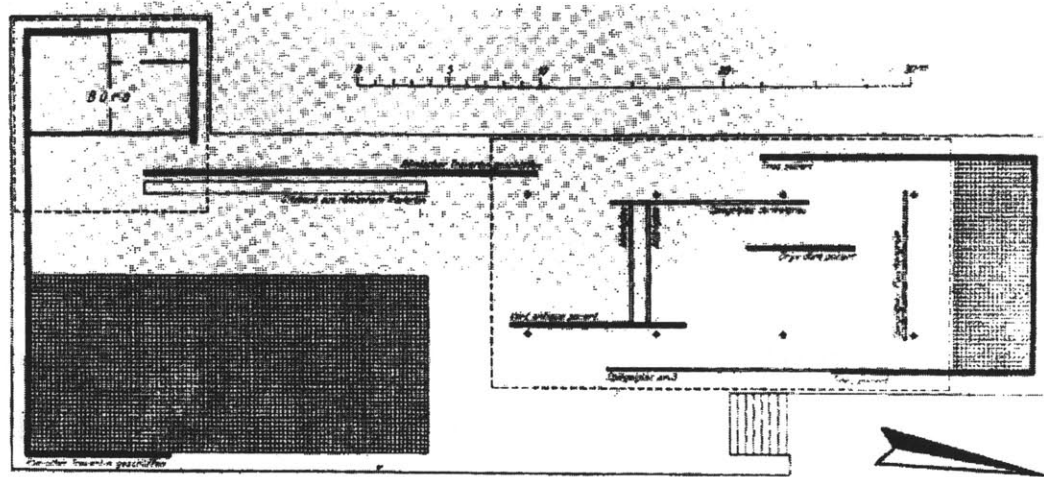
First published plan of the Barcelona Pavilion, 1929.
